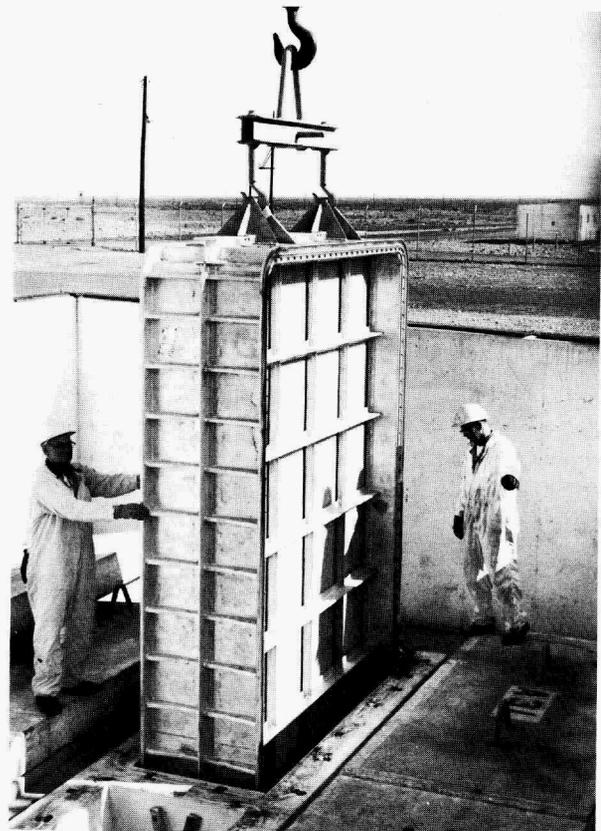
Remote filter change, Hanford production reactor. Lowering new frame assembly into pit. Note lifting assembly. Courtesy USAEC, Richland Operations Office.
